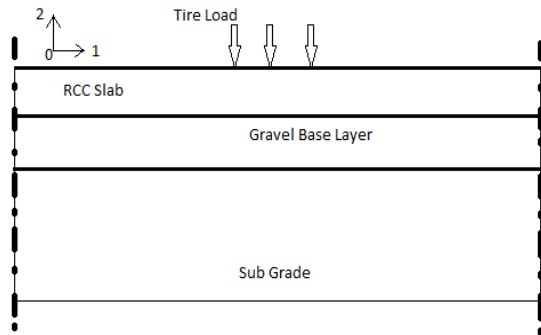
2D Model Adopted for a RCC Pavement under a Tire Load
